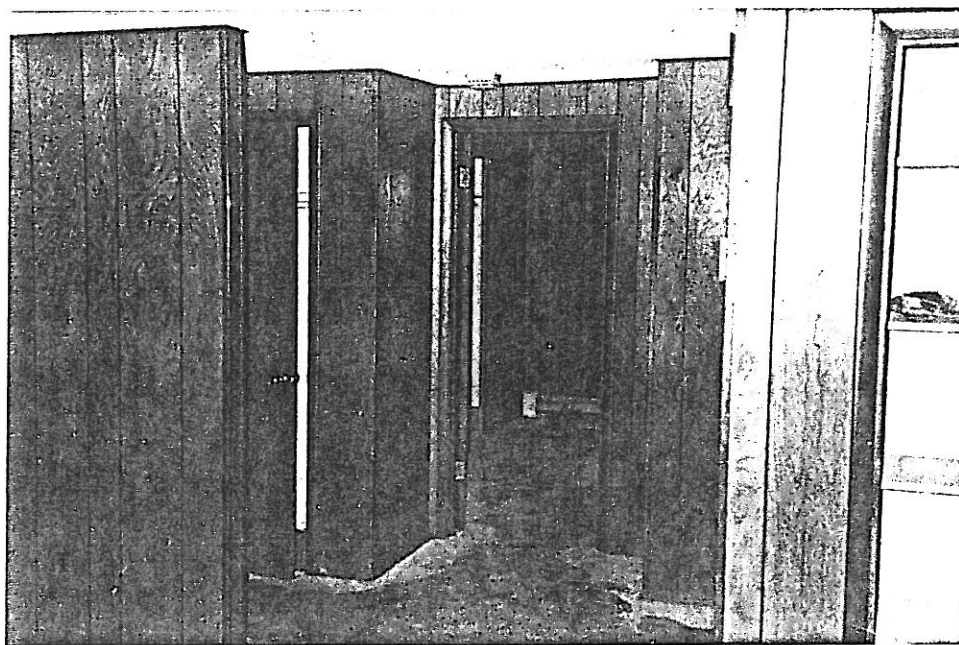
BASEMENT APARTMENT; HALLWAY AND BEDROOM AREA, CARPET IS WATER SOAKED IN THESE AREAS. PHOTO TAKEN FROM LIVING ROOM AREA.
